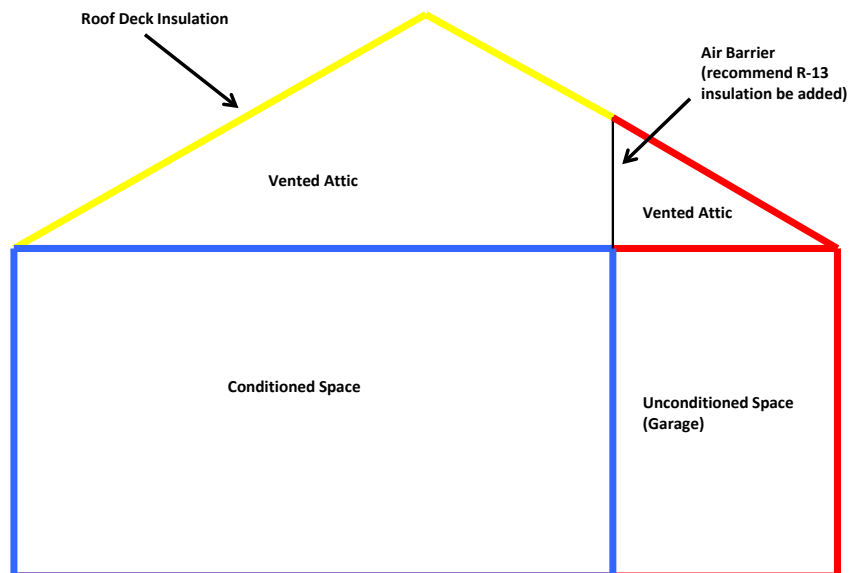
House with attic insulation extending over conditioned space, attic over conditioned and unconditioned space separated by an air barrier
